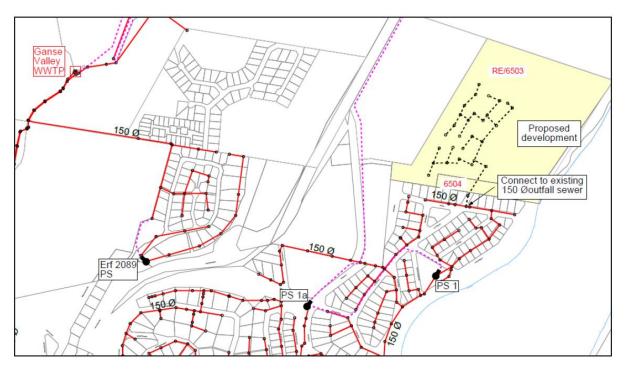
External sewer masterplan extracted from GLS Consulting (Feb, 2023).
